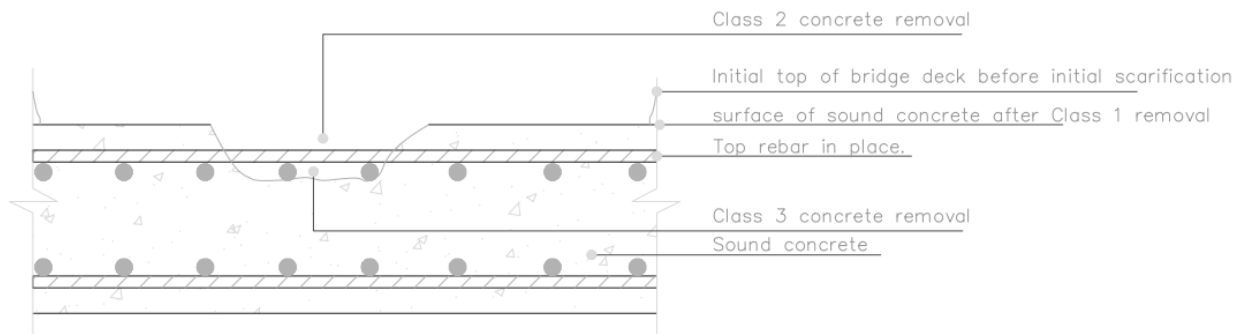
Bridge section depicting a delaminated sub-surface with embedded rebar
